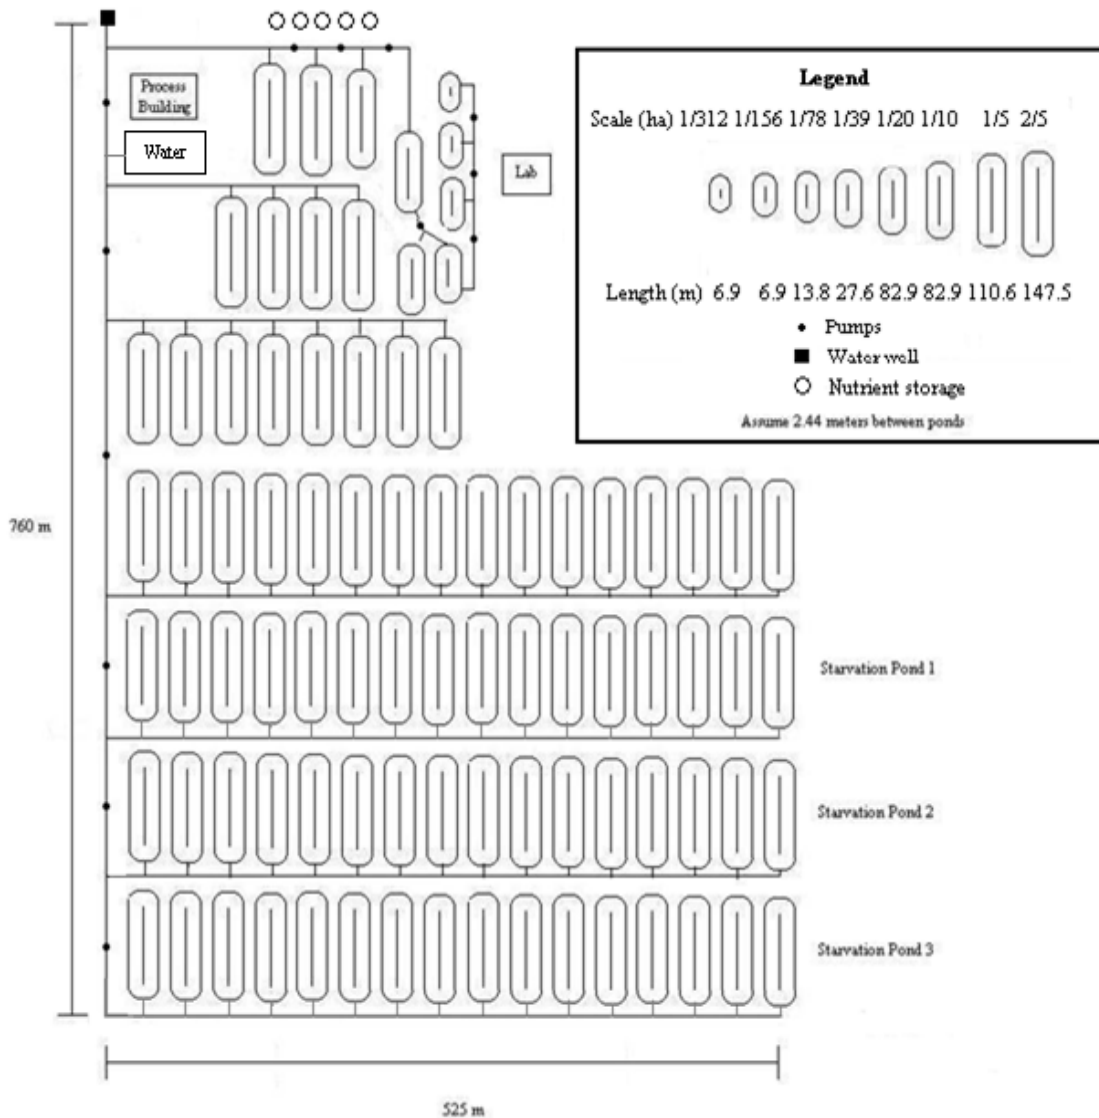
Facility layout considered to determine pipe infrastructure costs.
